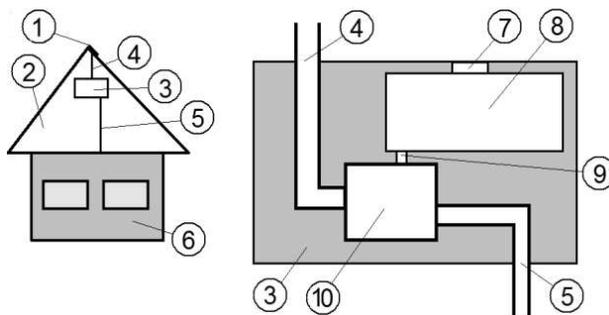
Distribution system: 1 – Sprayers; 2 – Roof; 3 – Tank; 4 – Mixed piping; 5 – Water supply system; 6 – Greenhouse; 7 – refilling opening; 8 – Integrated refilling tank; 9 – Dispenser; 10 – Mixing chamber.
